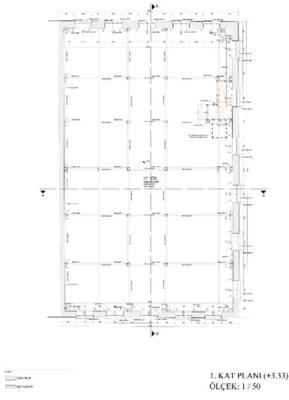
First Floor Plan (Drawn by Gedik Architectural Office)
